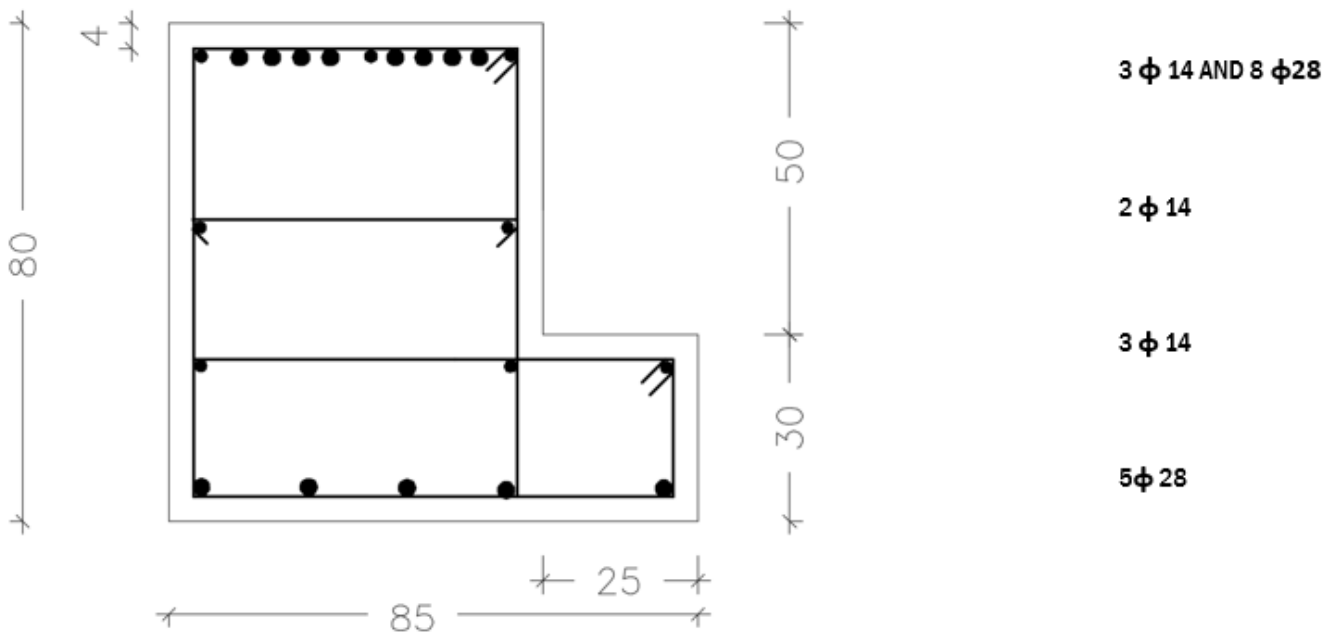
Typical Cross Section of L-Shaped Beams at Supports
